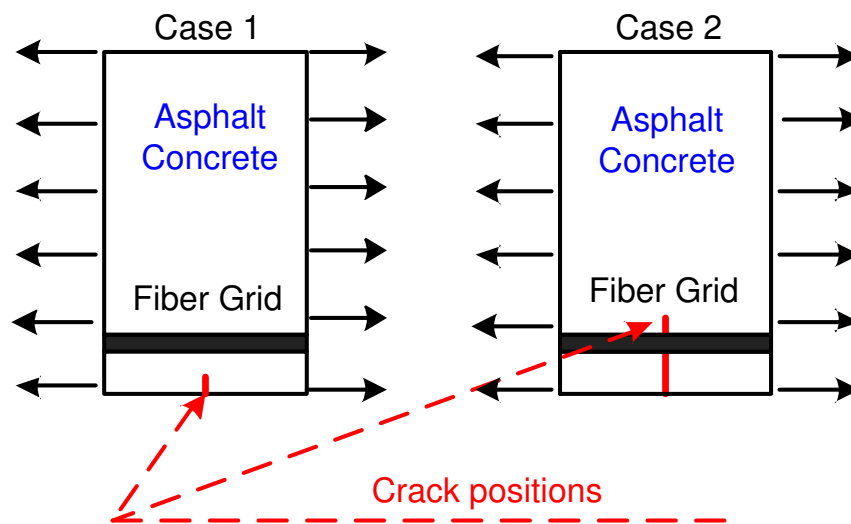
Crack initiates from the lower boundary of second asphalt concrete layer (case 1) and the bottom of the first asphalt concrete layer (case 2).
